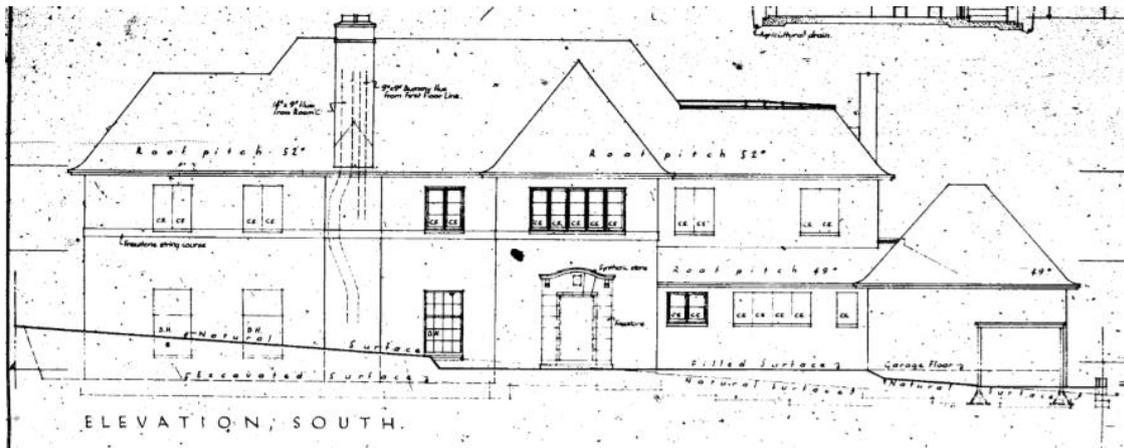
The principal elevation facing Yarrbat Avenue, from the original house plans. (Source: City of Camberwell Building Permit 9410, dated 8 March 1938)
